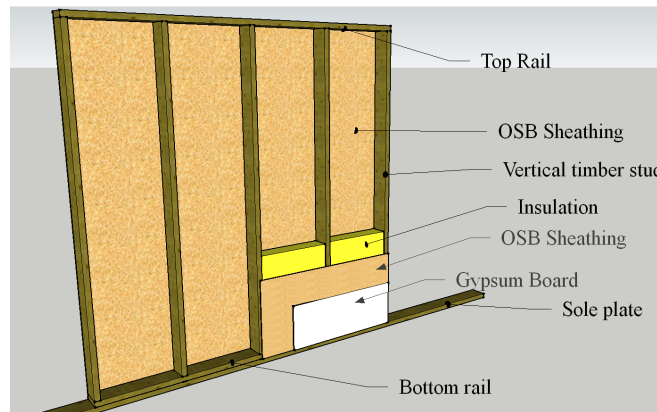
Cut away illustration of a typical timber frame wall panel. Framing, with vertical studs on 600 mm centres and OSB sheathing is shown. Walls are anchored to a sole plate which is fixed to the foundations of the structure. Insulation is used to fill the void between studs and sheathing. Insulation requirements often dictate stud size [39].
